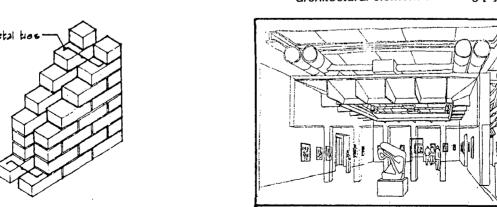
lighting, fire alarm, duct integrated with, architectural element of roofing [8]
